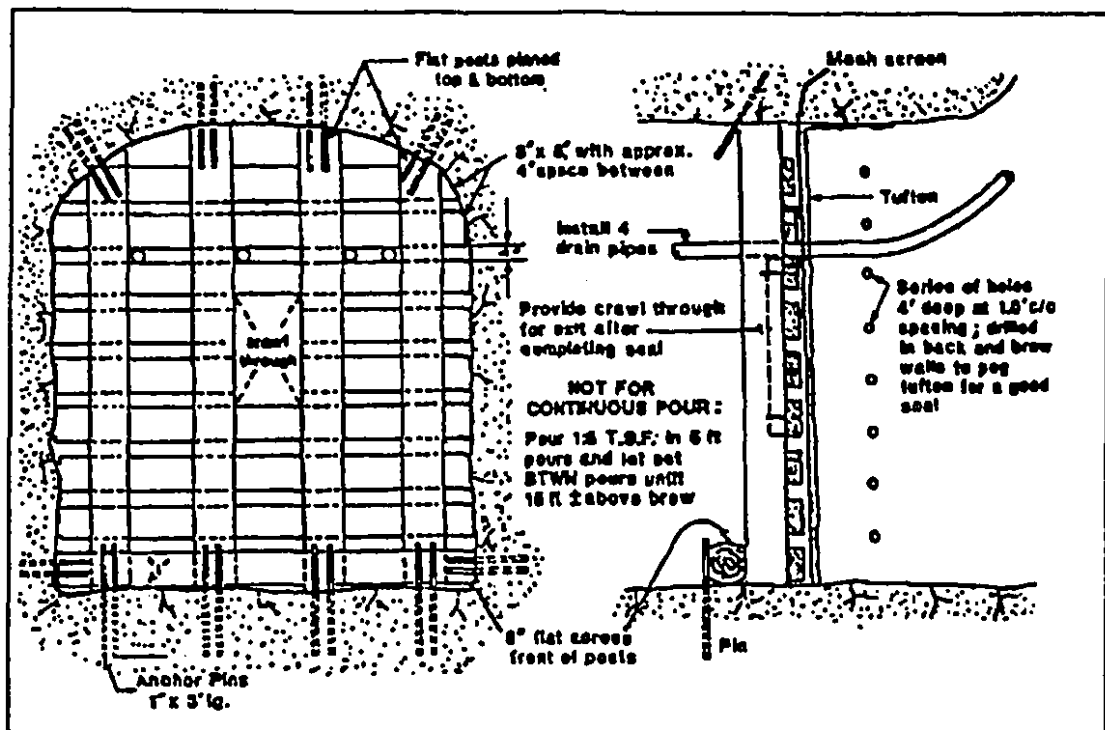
Fill bulkhead for blasthole stope in Falconbridge mines
